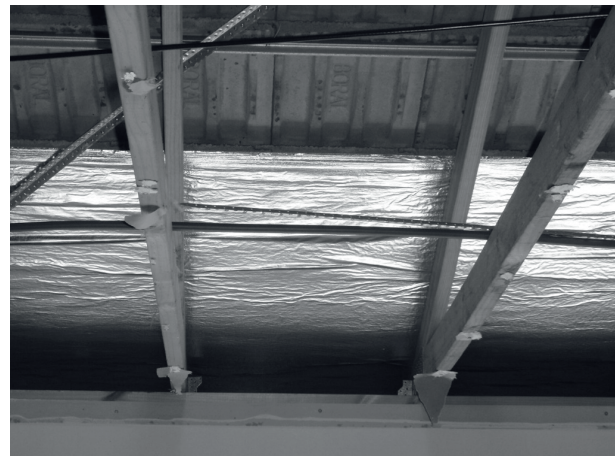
Tiled roof with sarking to lower 1 m of roof.
